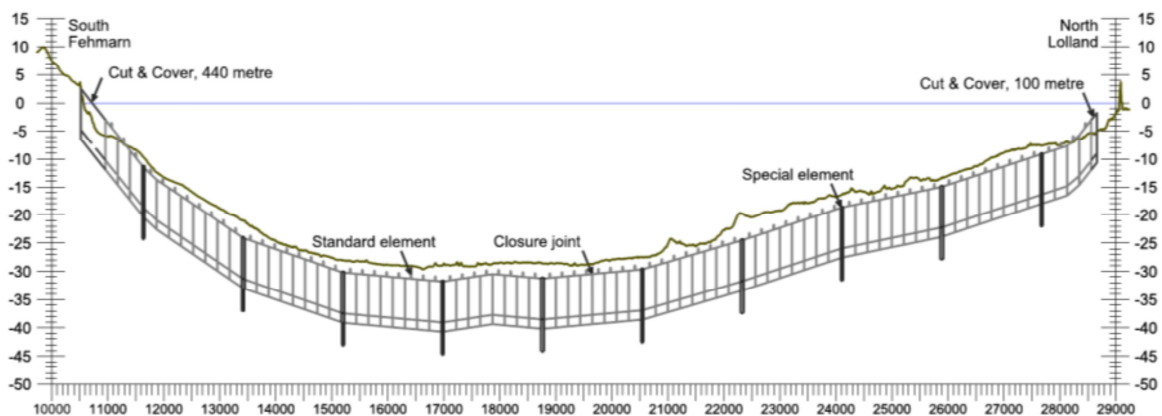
Vertical tunnel alignment showing depth below sea level
